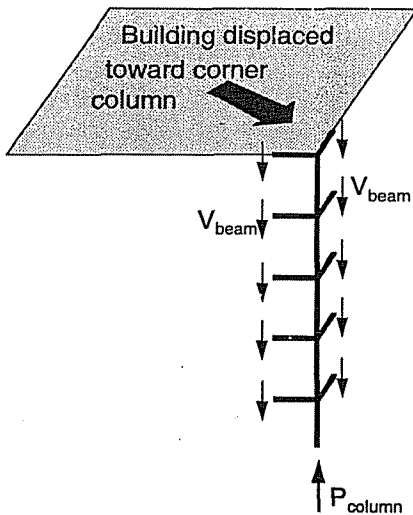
Axial Load In Corner Column Due to Load Transfer from Intersecting Frames
